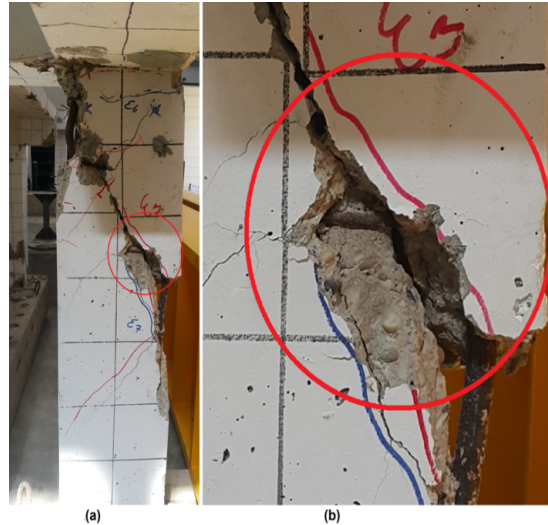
(a) Failure mode of the specimen RCF-2 at the end of the test, (b) stirrups failure due to corrosion
